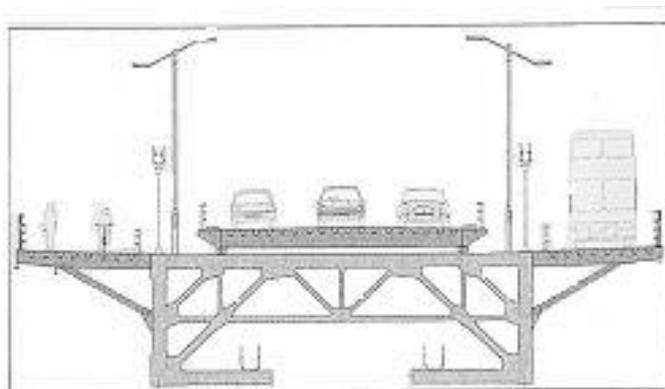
Cross section of Tamar Bridge following completion of renewal works
